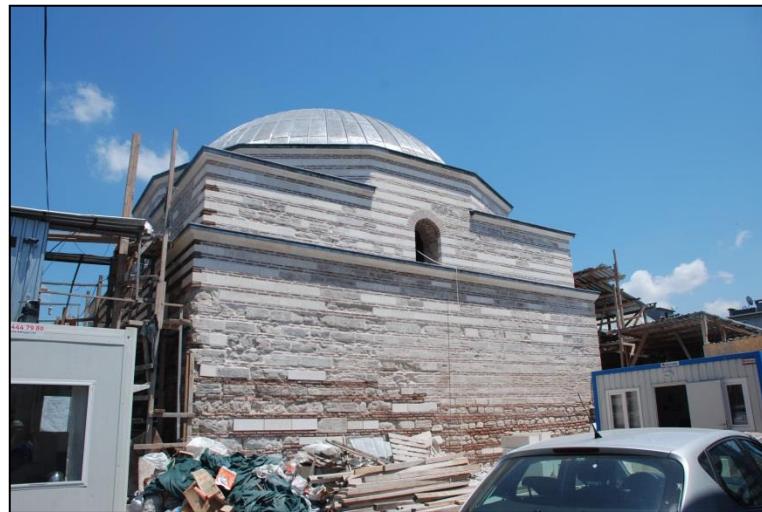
Zeyrek Çinili Bath, southwest elevation, 2015
